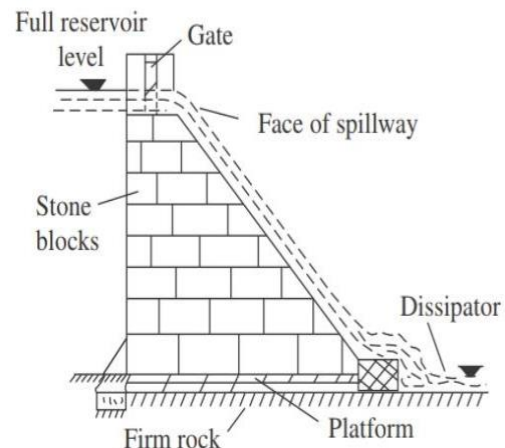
Masonry dam made of cut blocks of sound rock having gated spillway
